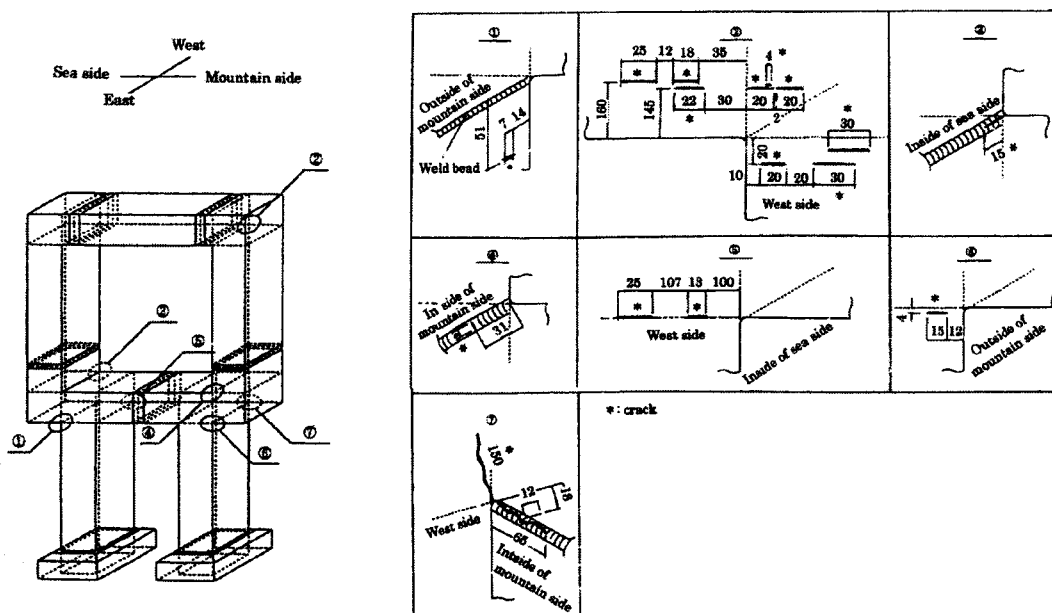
Cracks occurred at base metal and weld metal in beam to column connections of steel rigid frame pier P37 in Hamate Bypass.
